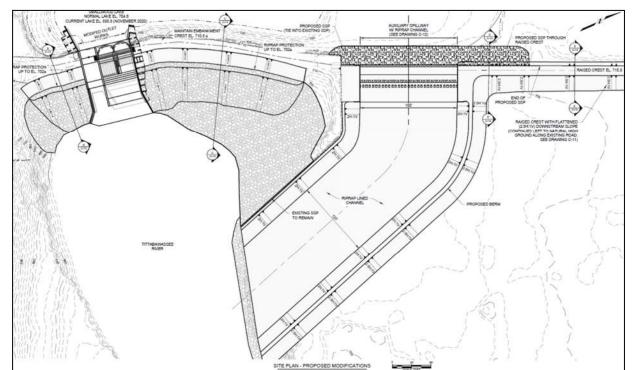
Plan View of Smallwood Dam Auxiliary Spillway
